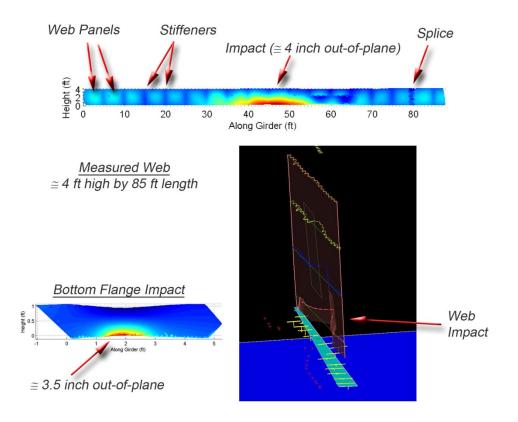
Measurement of girder web and bottom flange impact damage.
